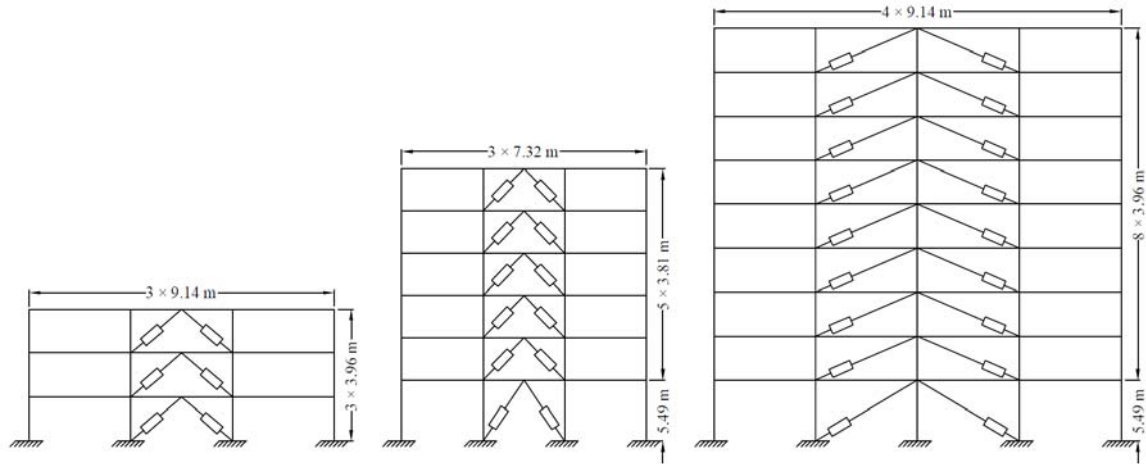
Elevation view of the selected steel frame buildings and configuration of hysteretic dampers
